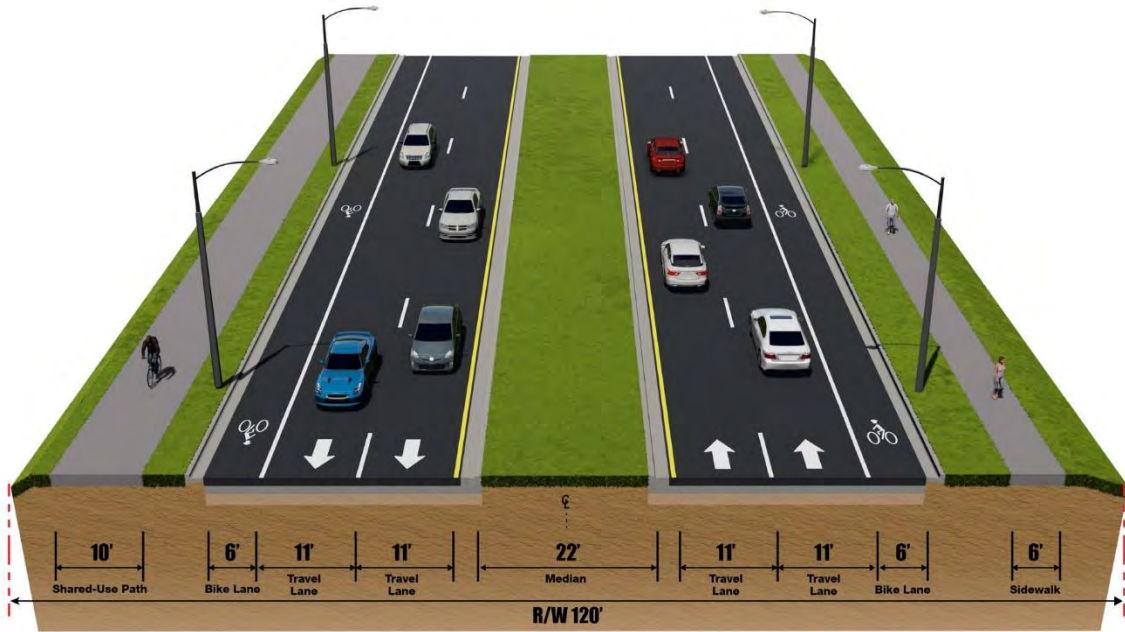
Fort Hamer Road Preferred Alternative Typical Section
